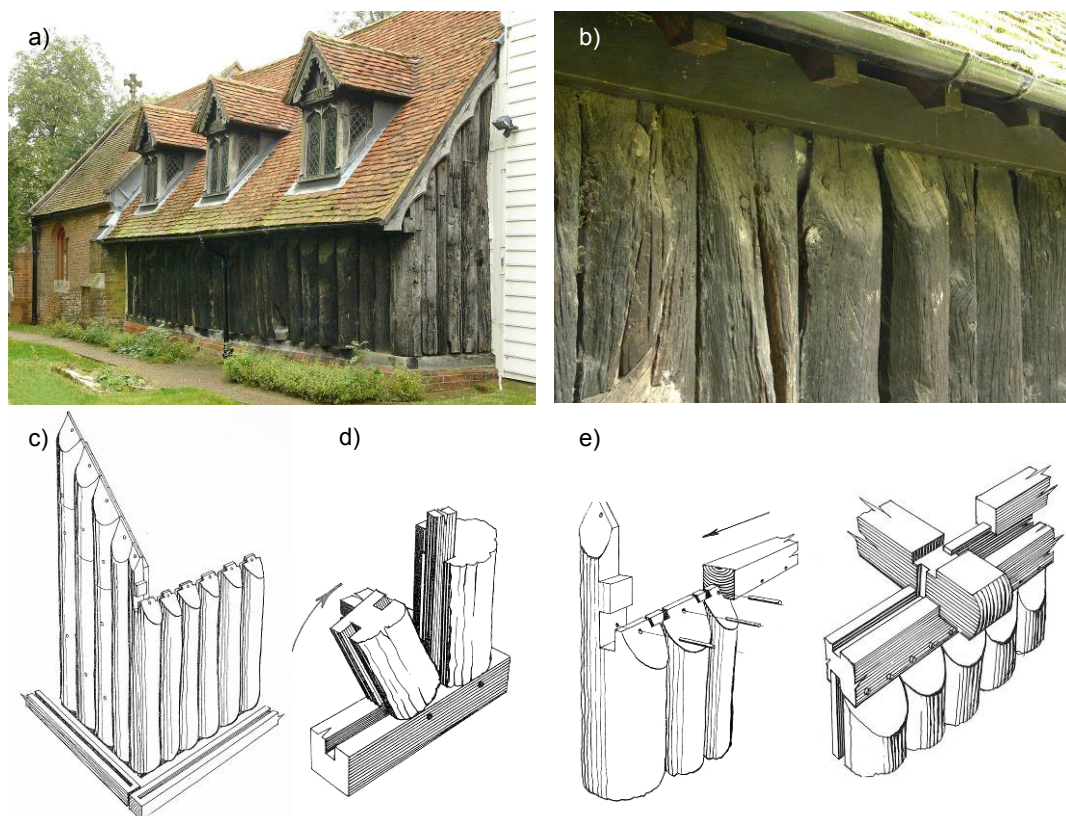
Greenstead (England), a church with fragments of walls from 845 (!); a - north-western corner, b - fragment of the northern wall, c, d, e - drawings of joist connections for wall beams. Source: photo by author in 1998, drawings by [6]
